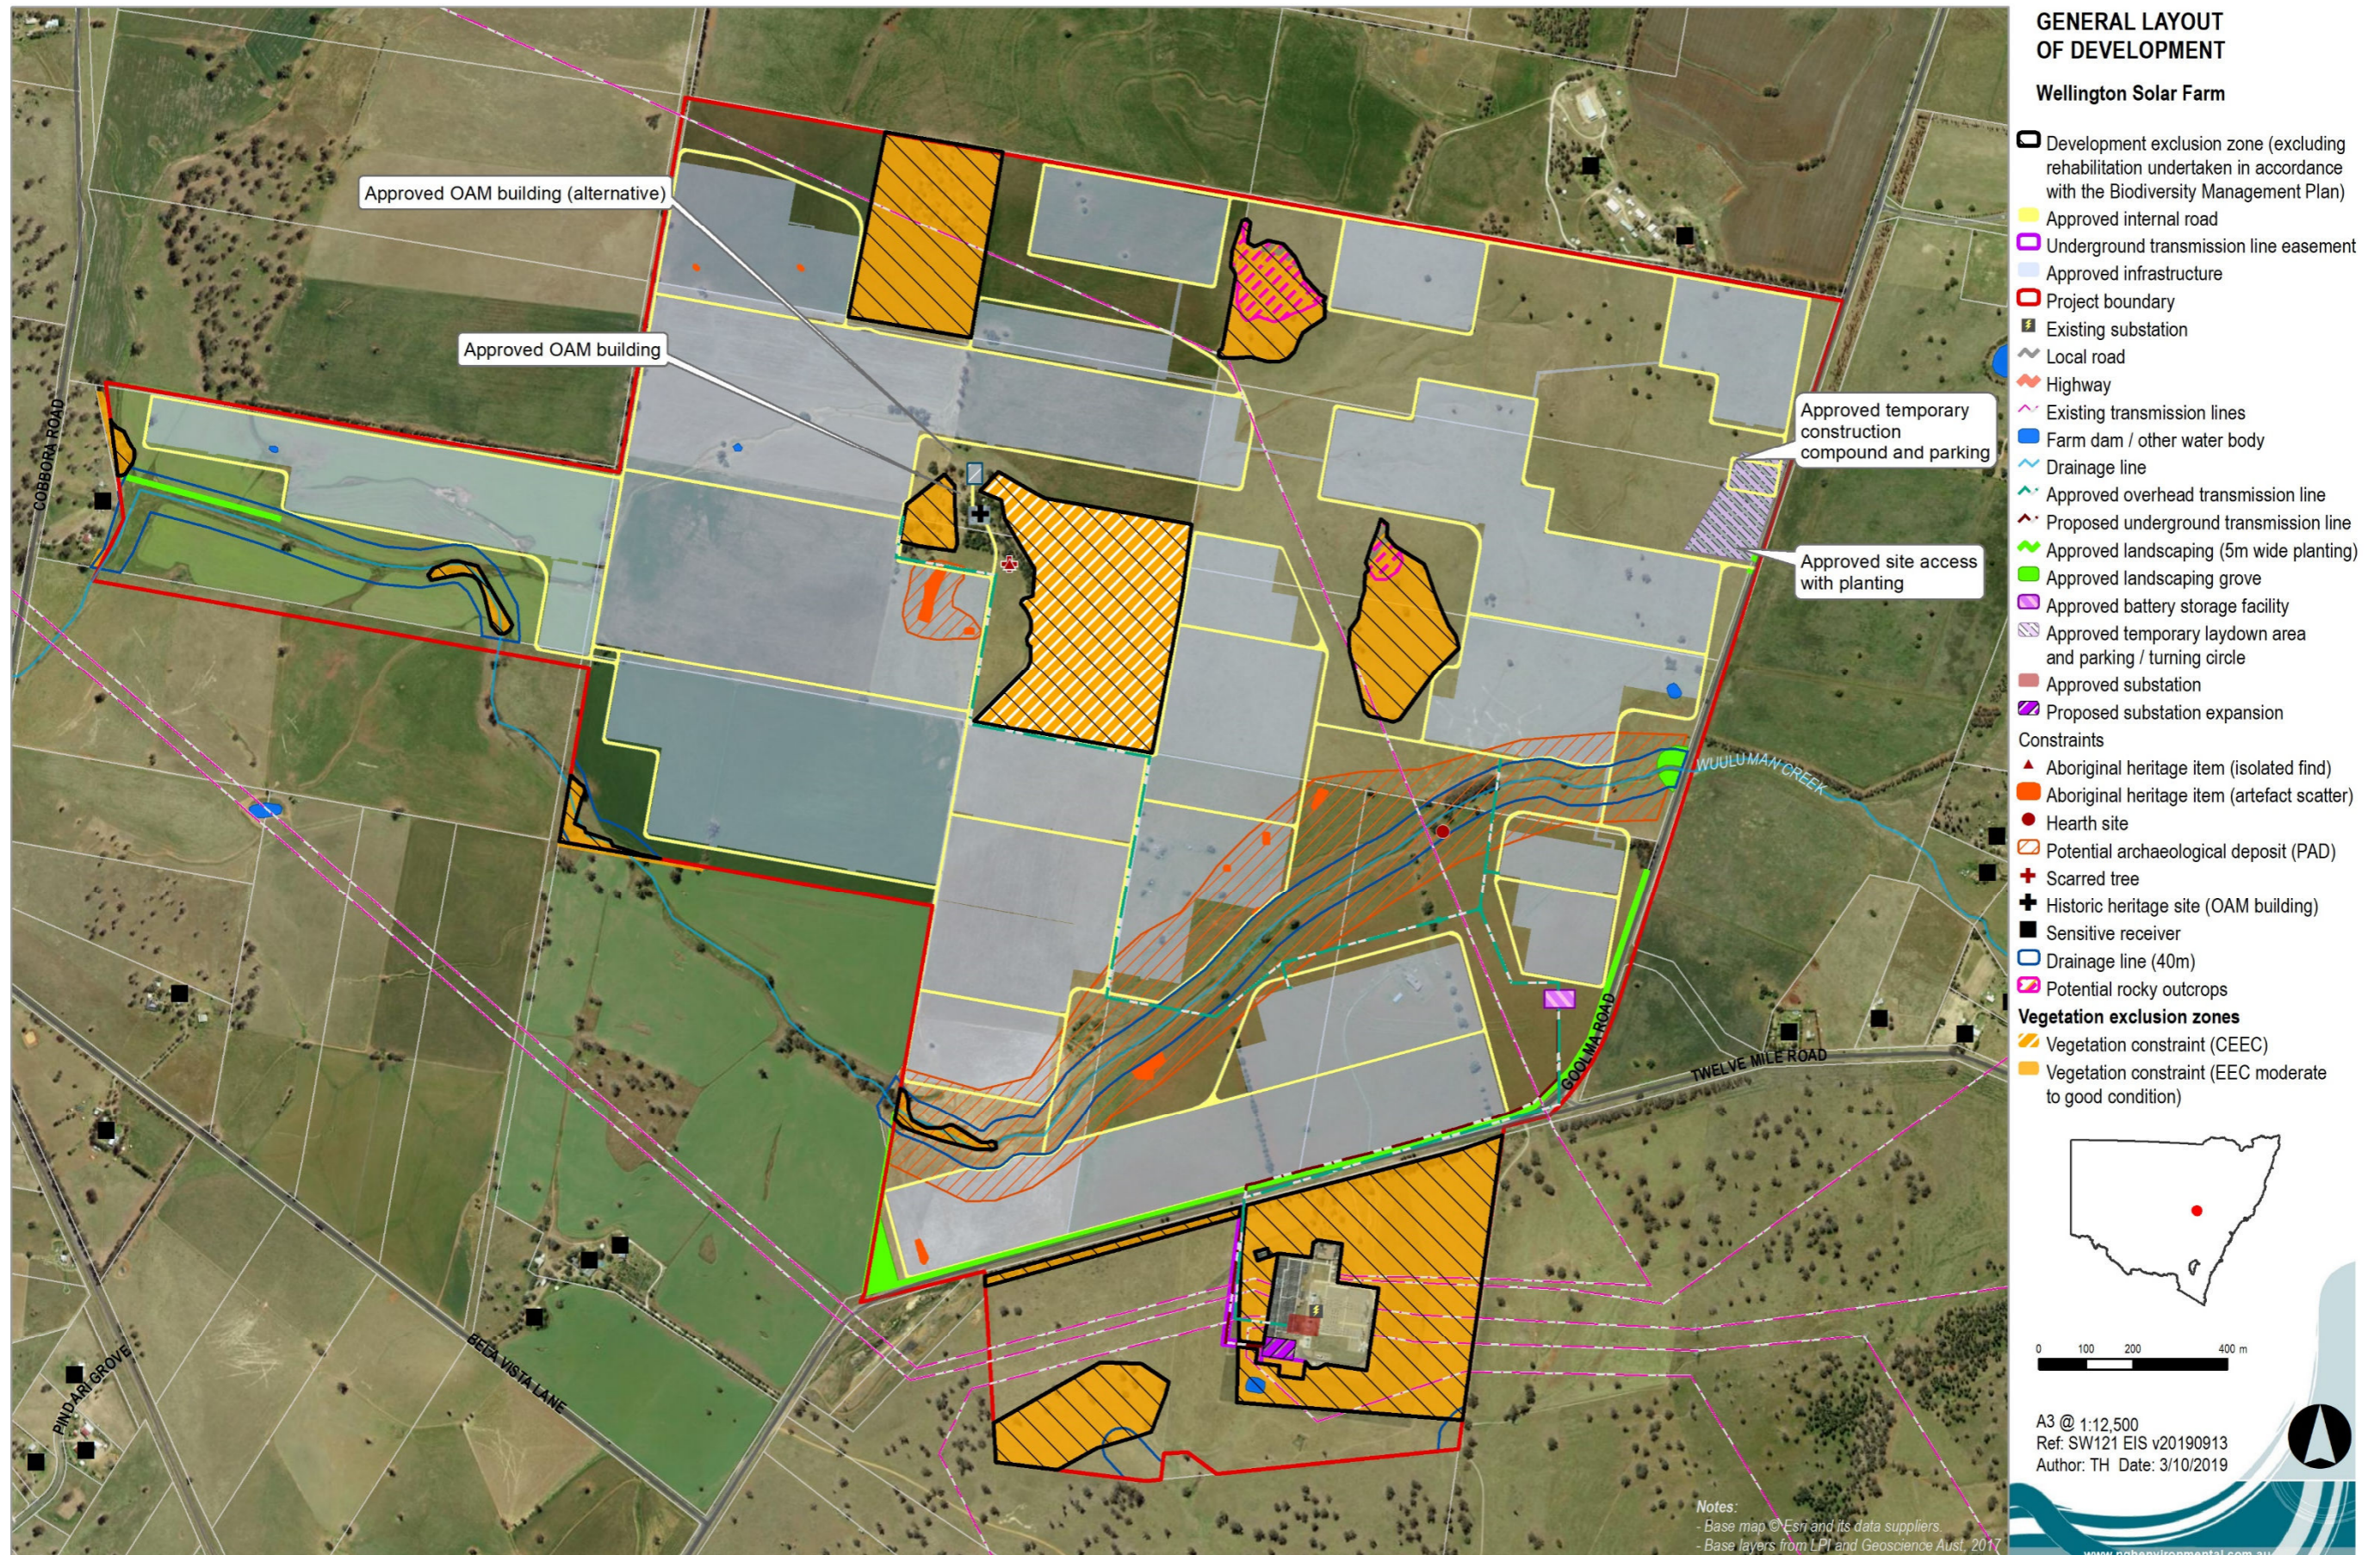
Proposed substation expansion easement with substation bench (zoom out)
